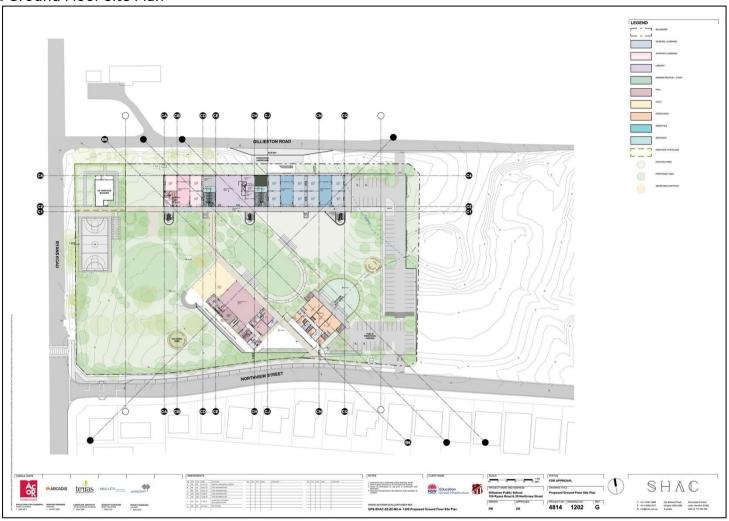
Proposed ground floor site plan. File name: 4814. Gillieston PS.5. Architectural Drawings. 241115. pdf; Page 6 of 35; Drawing No: 1202; Rev: G.
